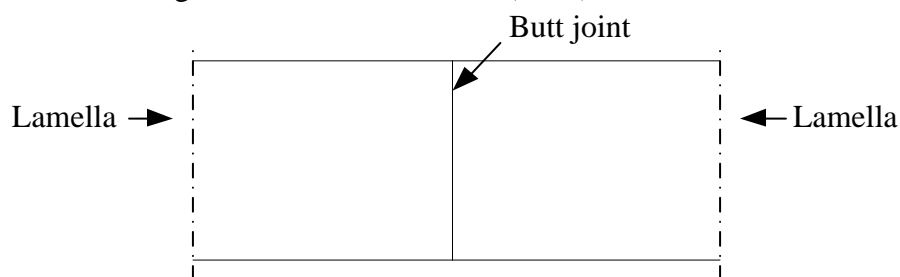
Elevation of a butt joint in a stress-laminated-timber deck.
